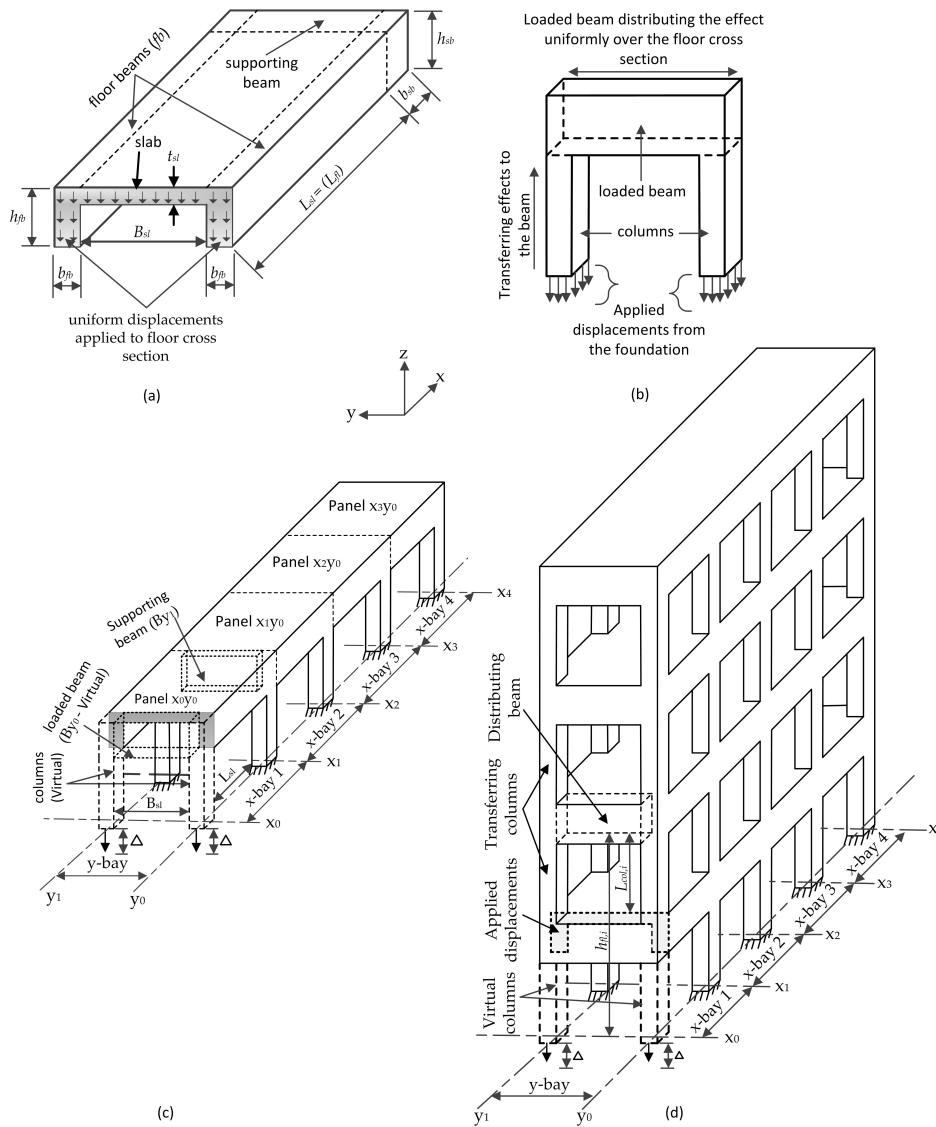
(a) Typical floor subjected to displacements, (b) conveying displacement effects through columns to beams, (c) typical numerical model of a single storey, single y-bay building, (d) single y-bay, multi x-bay and multi storey building
